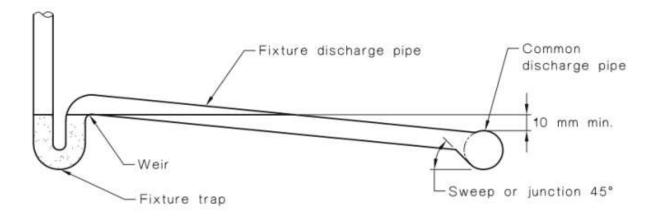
TYPICAL CONNECTION OF FIXTURE DISCHARGE PIPE
